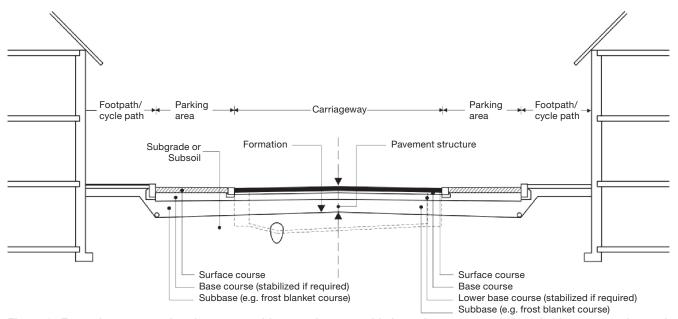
Example pavement in urban areas with water-impermeable boundary areas and closed side construction and with drainage facilities
